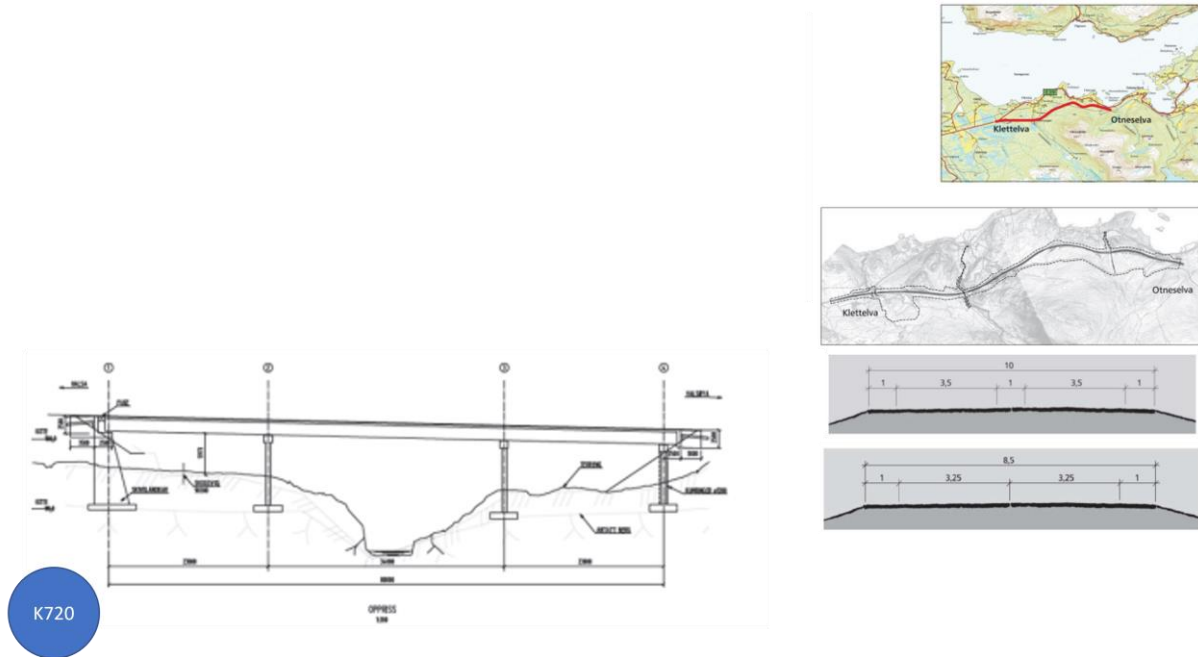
shows all bridges in the parcel Klettelva-Otneselva with zoning plan and 2 road sections H4 and H2
